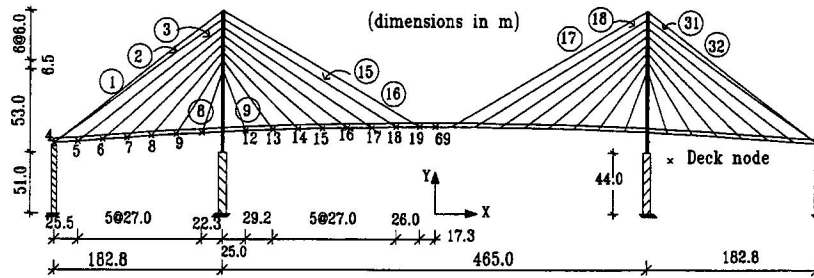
Bridge Geometry of a Conventional Type Cable-Stayed Bridge
